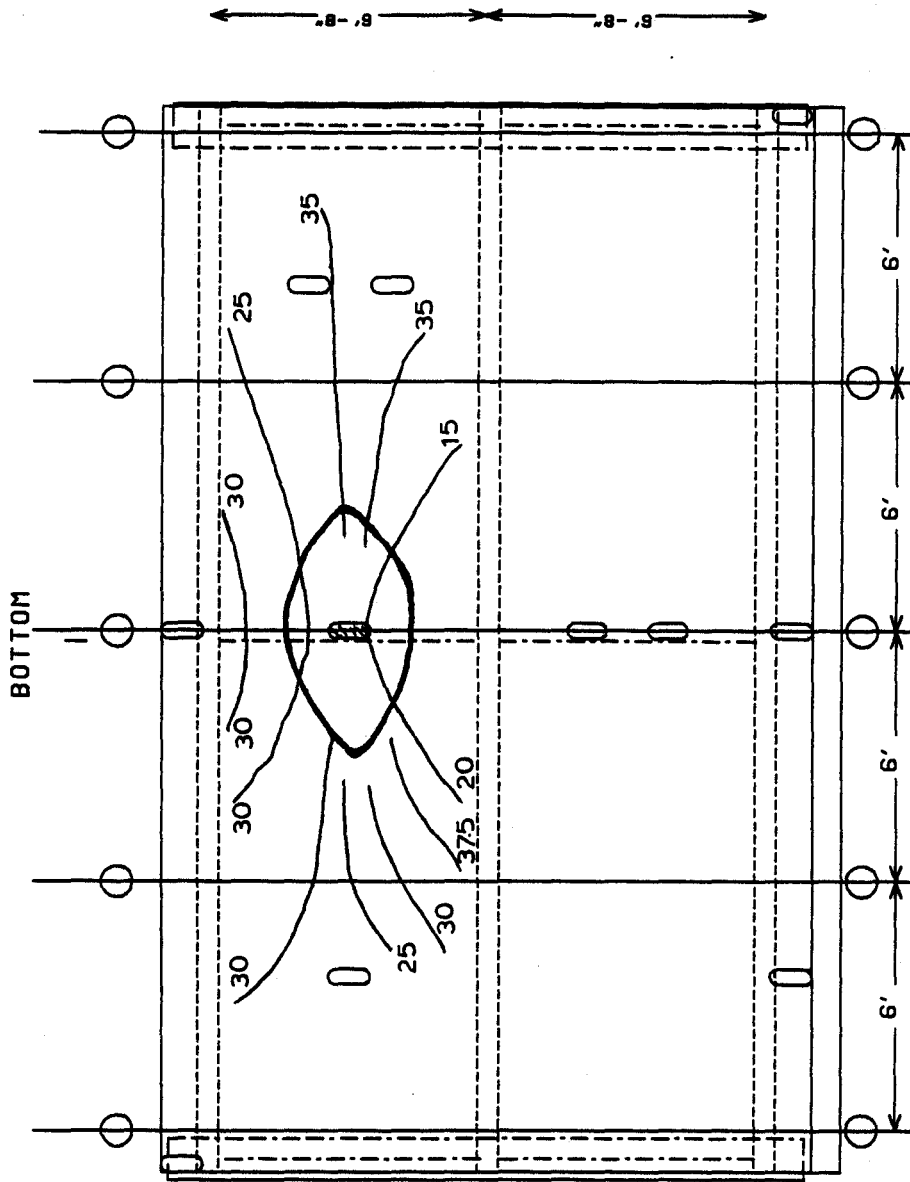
Bottom Cracking Pattern (First Bridge - Test No. 1)
